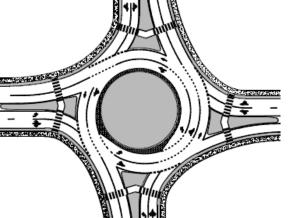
Multilane Major Street with Single Lane on Minor Street
